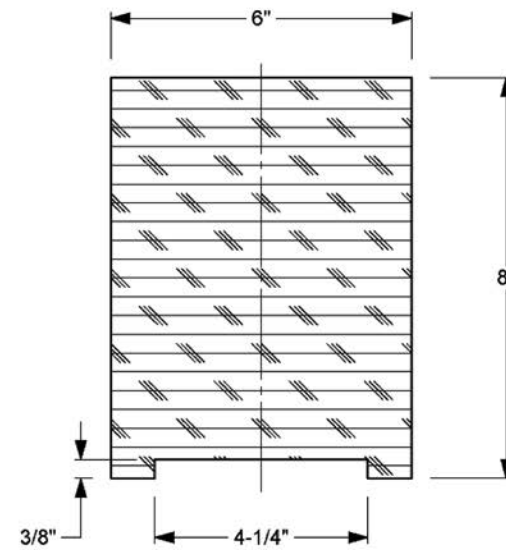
Tests 612941-02-1 and -2 guardrail post.
